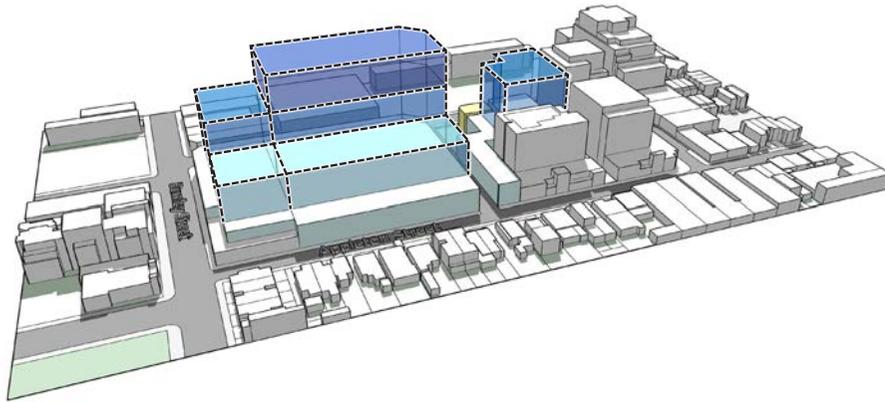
Suggested Framework Plan - Potential Development Zones - View 1
